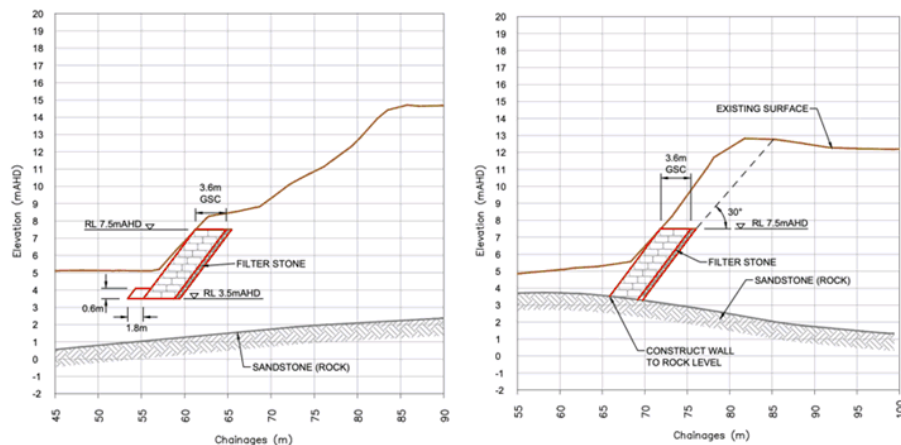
Concept Sketch of partially buried GSC revetment showing cross section A (southern section, left) and F (northern section, right)
